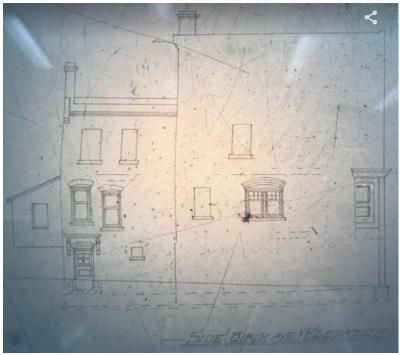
1921 Architectural drawing showing proposed alterations to the south elevation of the corner property at 1196 Yonge for C.H. Stainton (Building Records)
